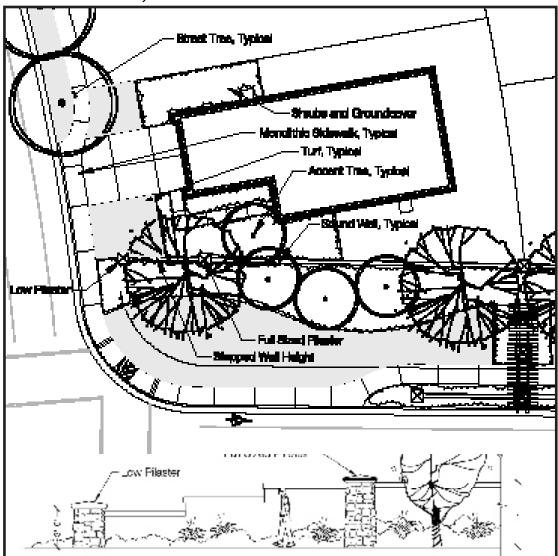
Soundwall and Pilaster Diagram, Plan & Section
